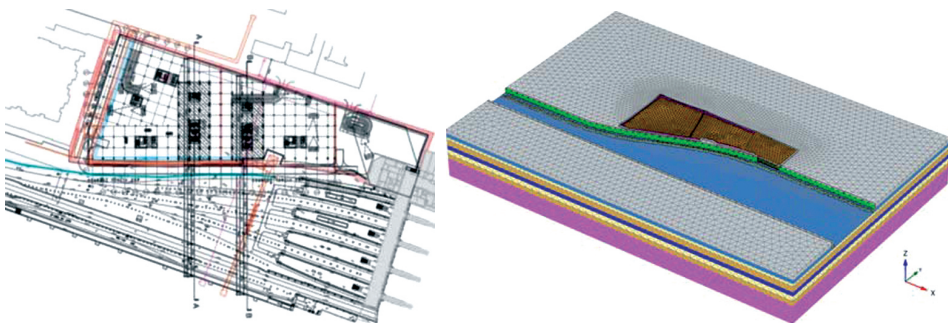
Deep excavation in the vicinity of active railway tracks: situational plan (left) and spatial model of the subsoil and objects (right)
